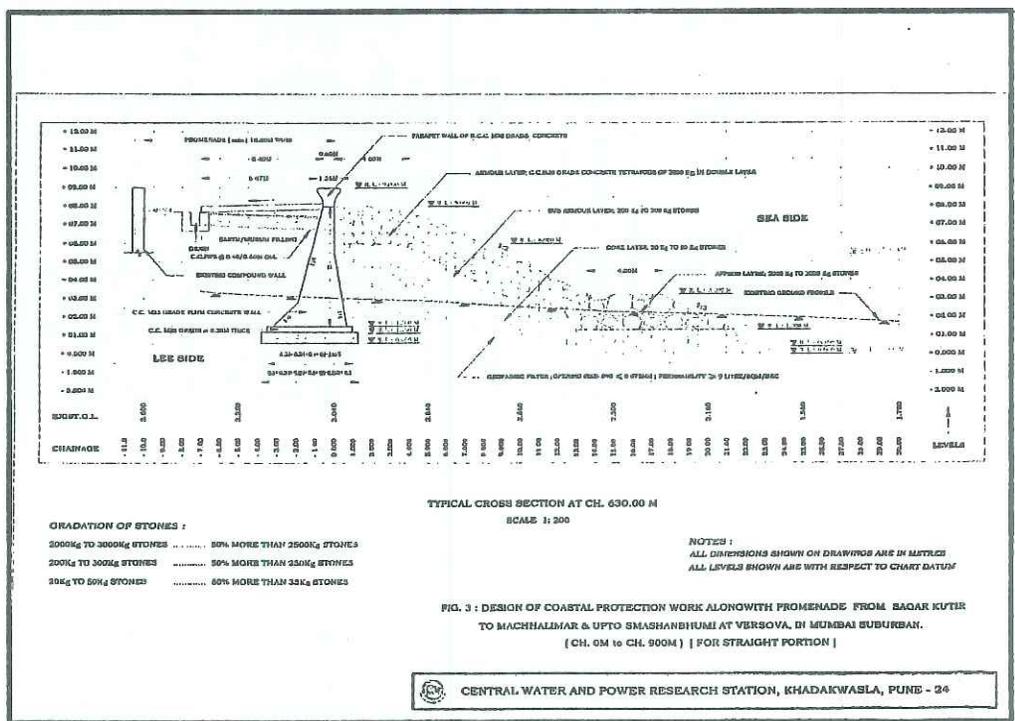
(B) layout plan Typical Section at CH. 630.00M (For Straight Portion)
